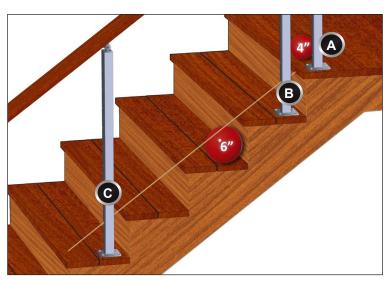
Figure A. Place your top stair post and position it so the space between the stair and deck posts is less than 4". Code requires that a 6" sphere cannot fit through the triangle created by the stair rise, stair tread and the bottom row of cable.
